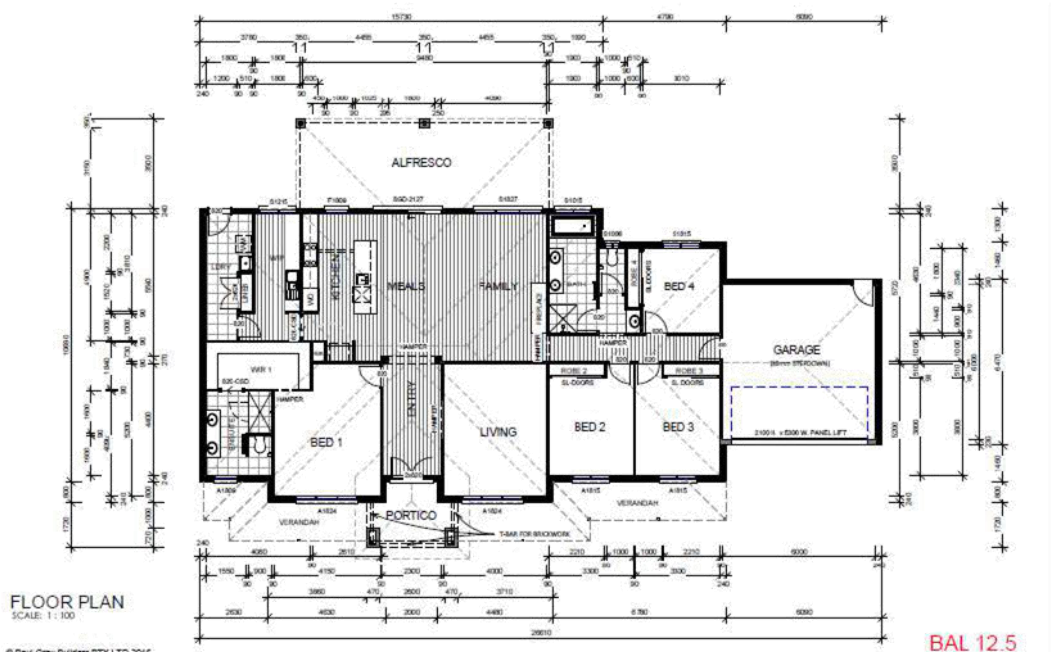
Floor Plan of Dwelling (Source: Application Plans)
